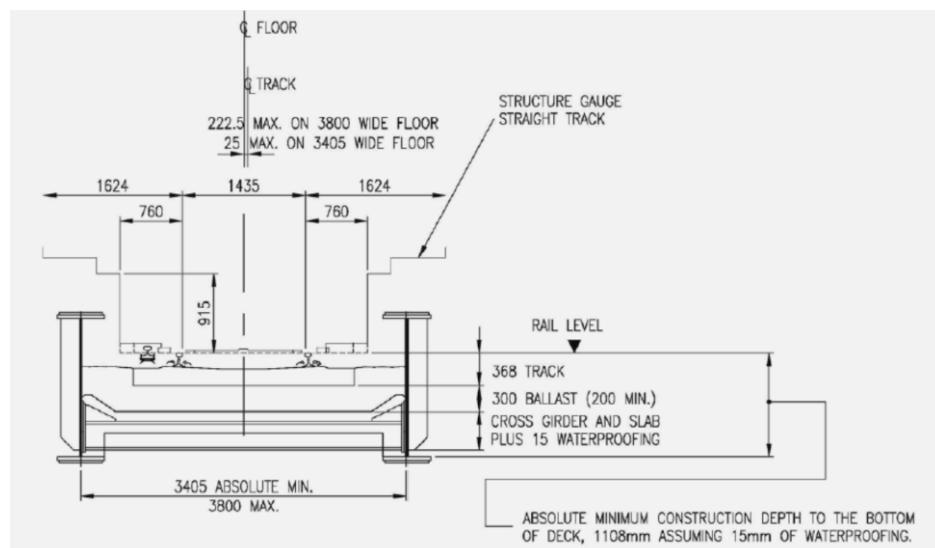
Cross section NR D type bridge with filler beam floor.
